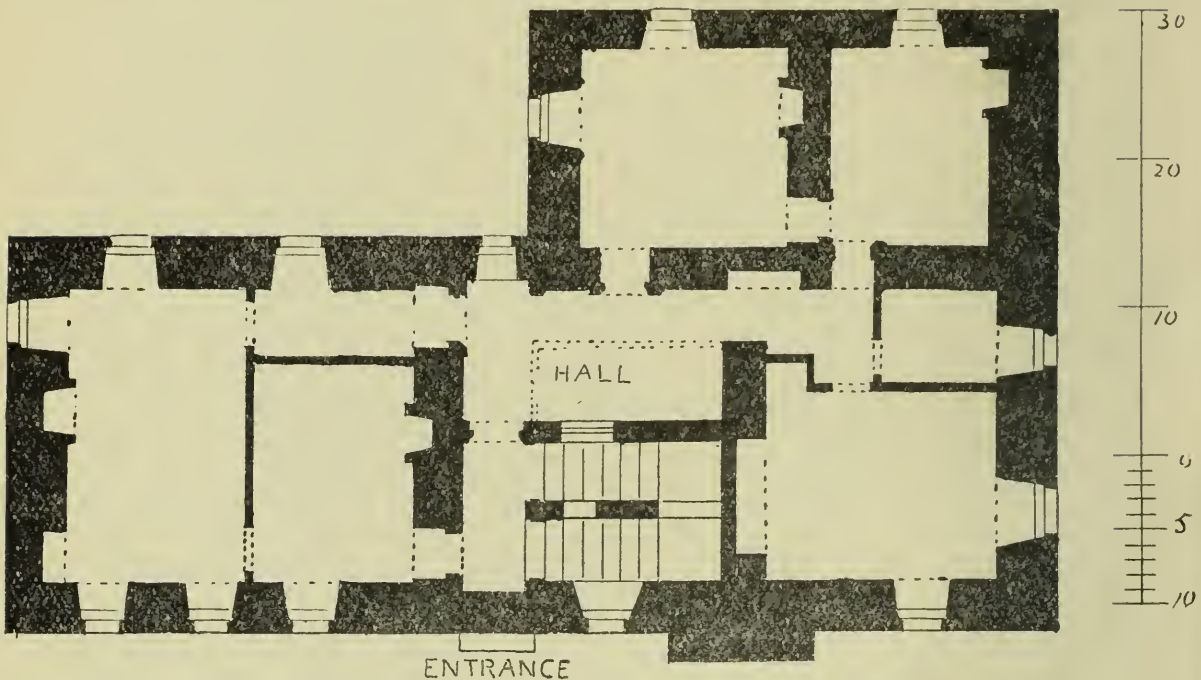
Old House, Bank Street, Thurso (No. 425); Ground-plan.
